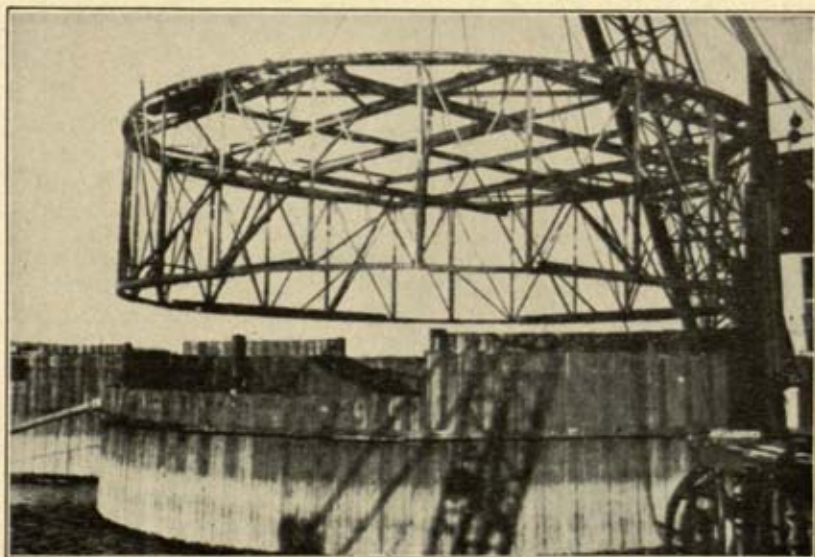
Template is lifted out of finished cell to be used again.
